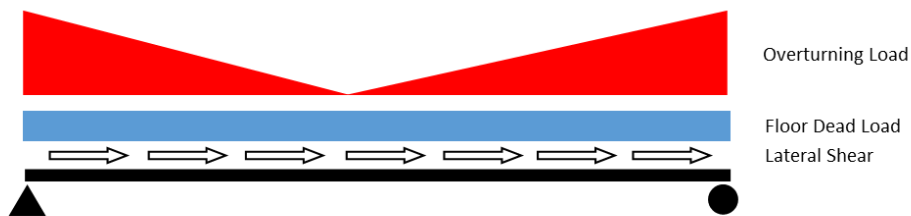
Type II Hybrid Typical Beam Load Diagram
